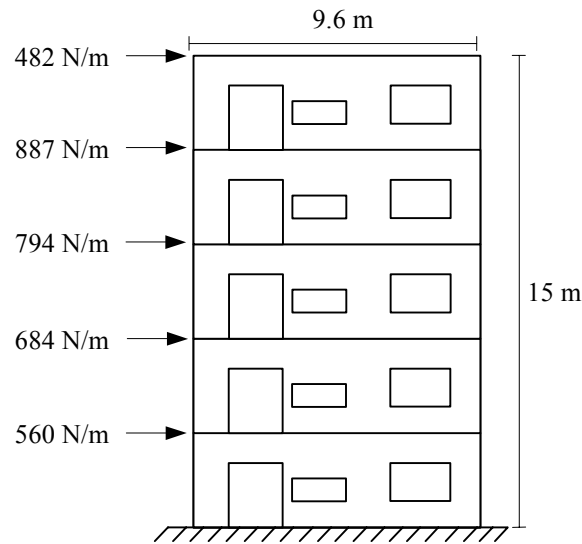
A simplified section of a five-story building showing the horizontal force of the wind load acting on the floor at each level.
